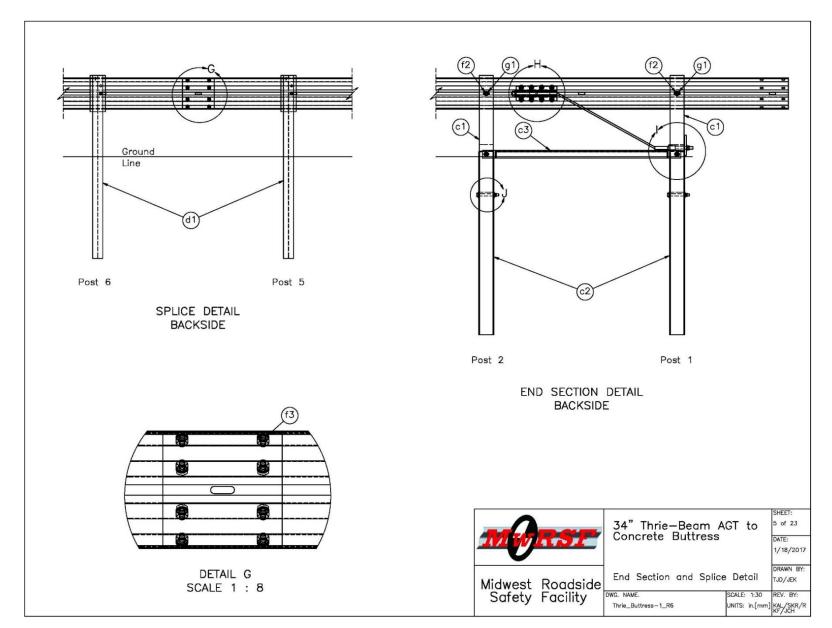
End Section and Splice Detail, Test Nos. 34AGT-1 and 34AGT-2
